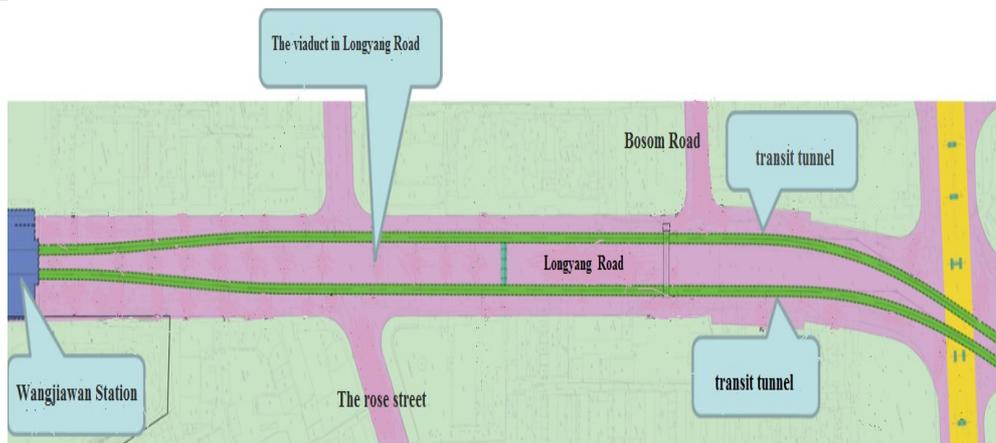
Schematics of Wangjiawan Station and Zongguan concerning Longyang Road station intervals overpass plane location
